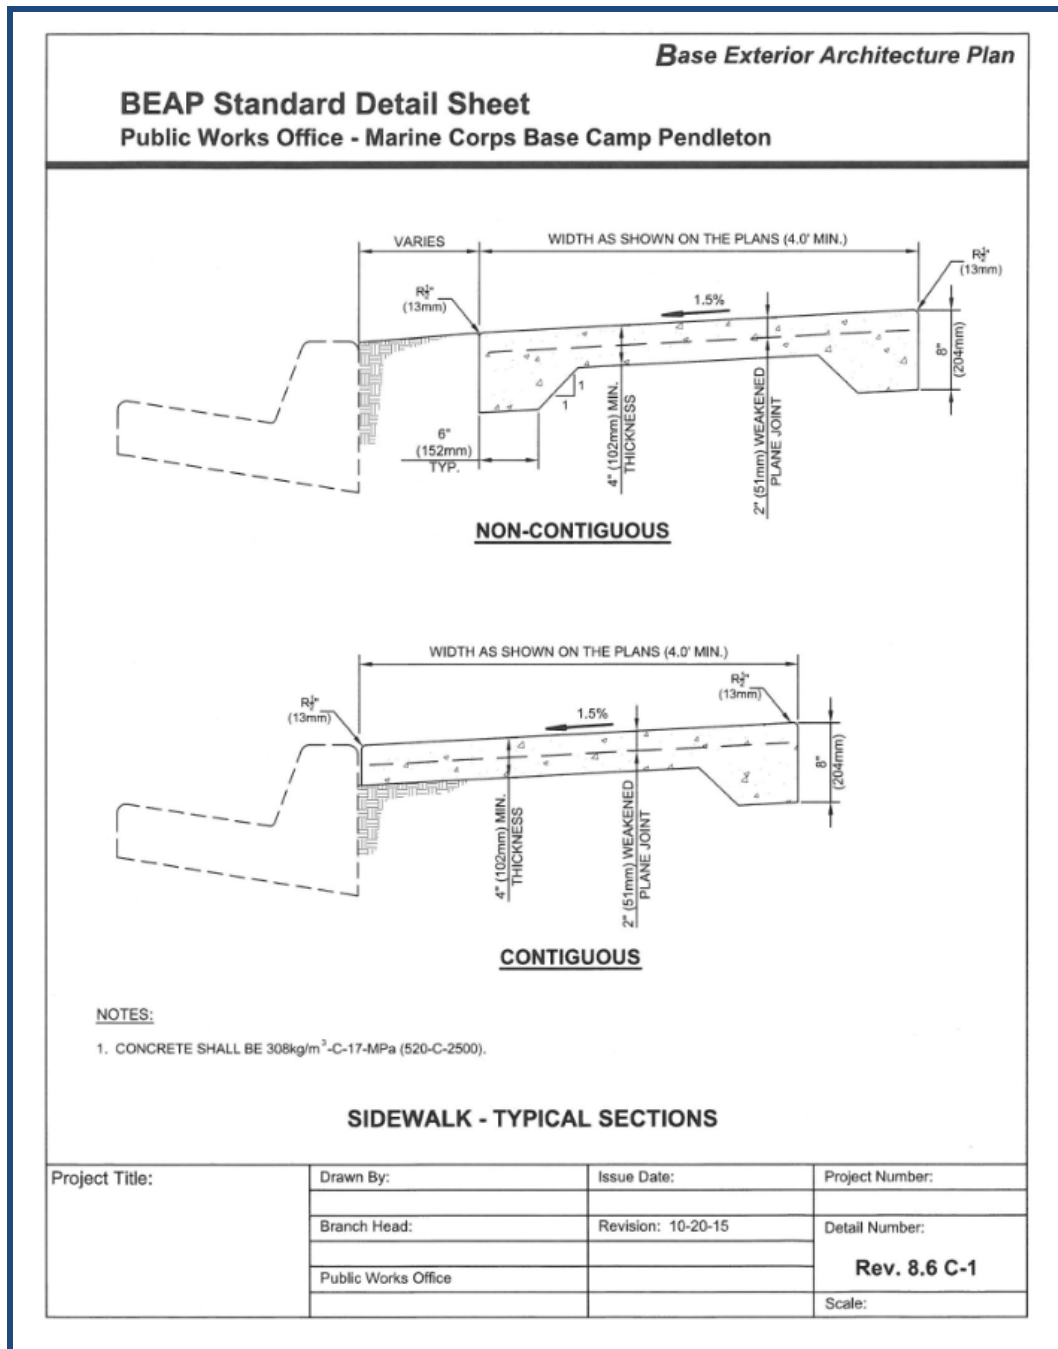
Sidewalk-Typical Sections, BEAP Rev. 8.6 C-1
